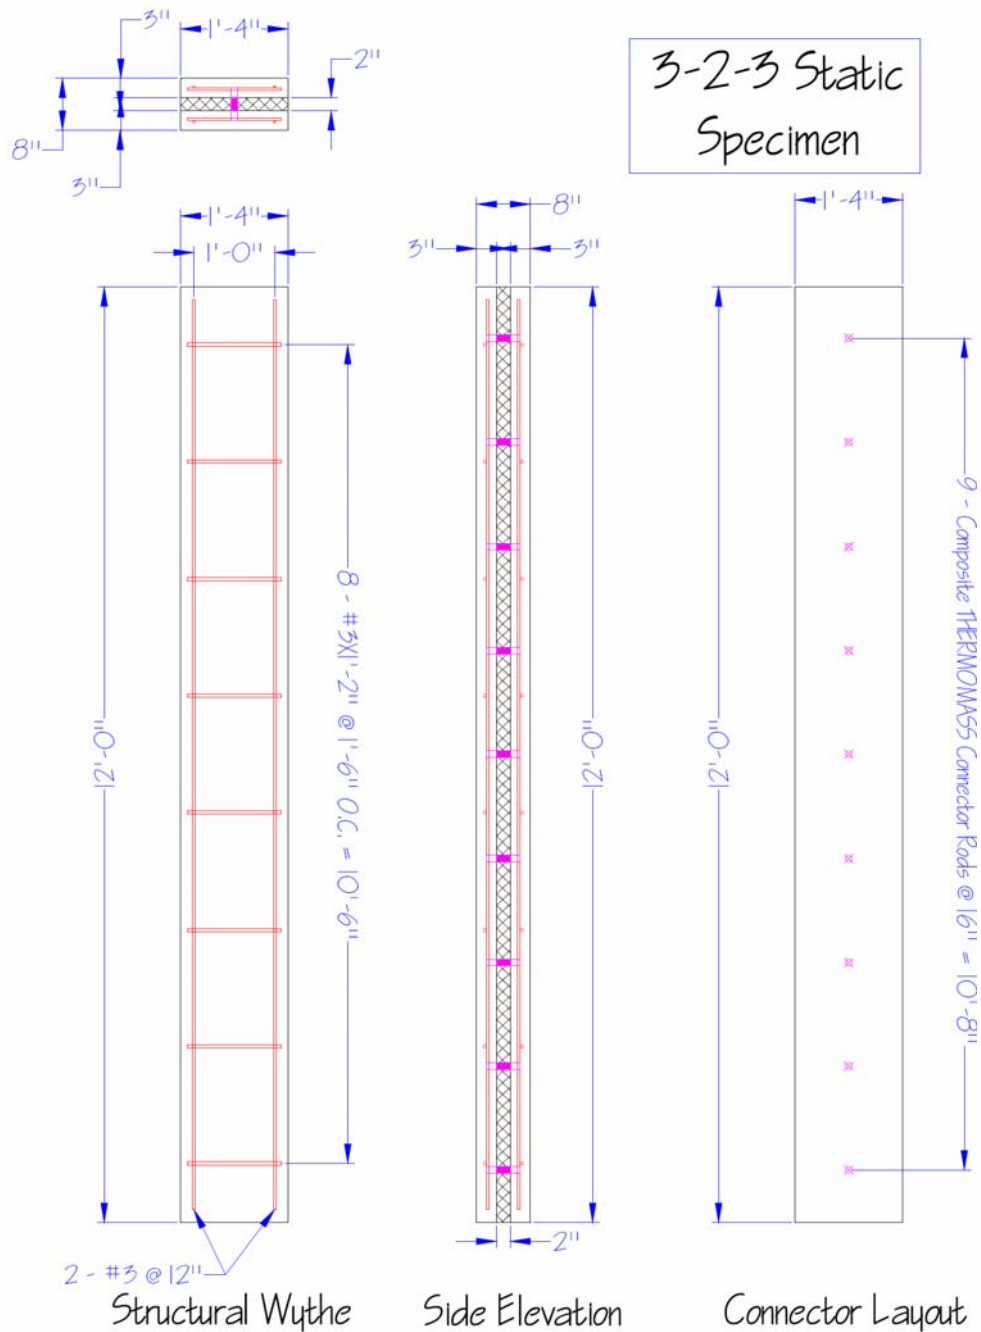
Conventionally reinforced 3-2-3 static sandwich panel specimen
